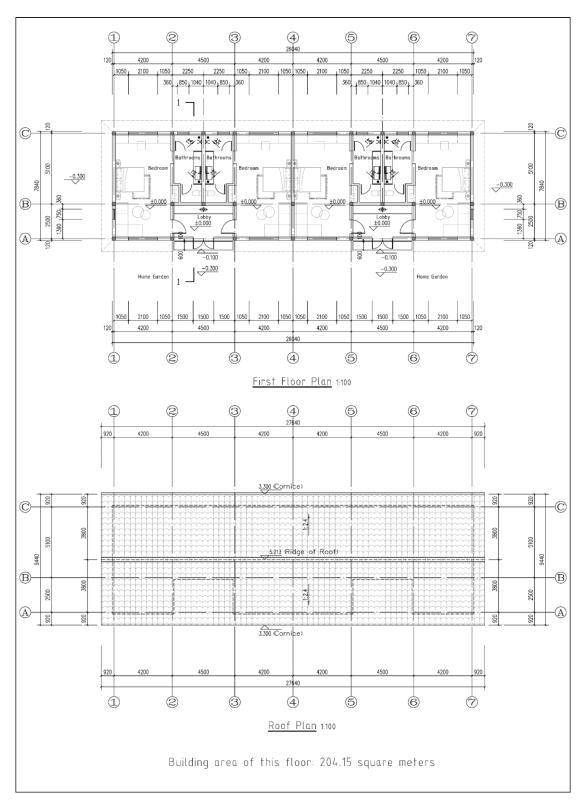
The First Floor Plan and Roof Plan of Sample Guest Room No. 2 (Drawn by the author)
